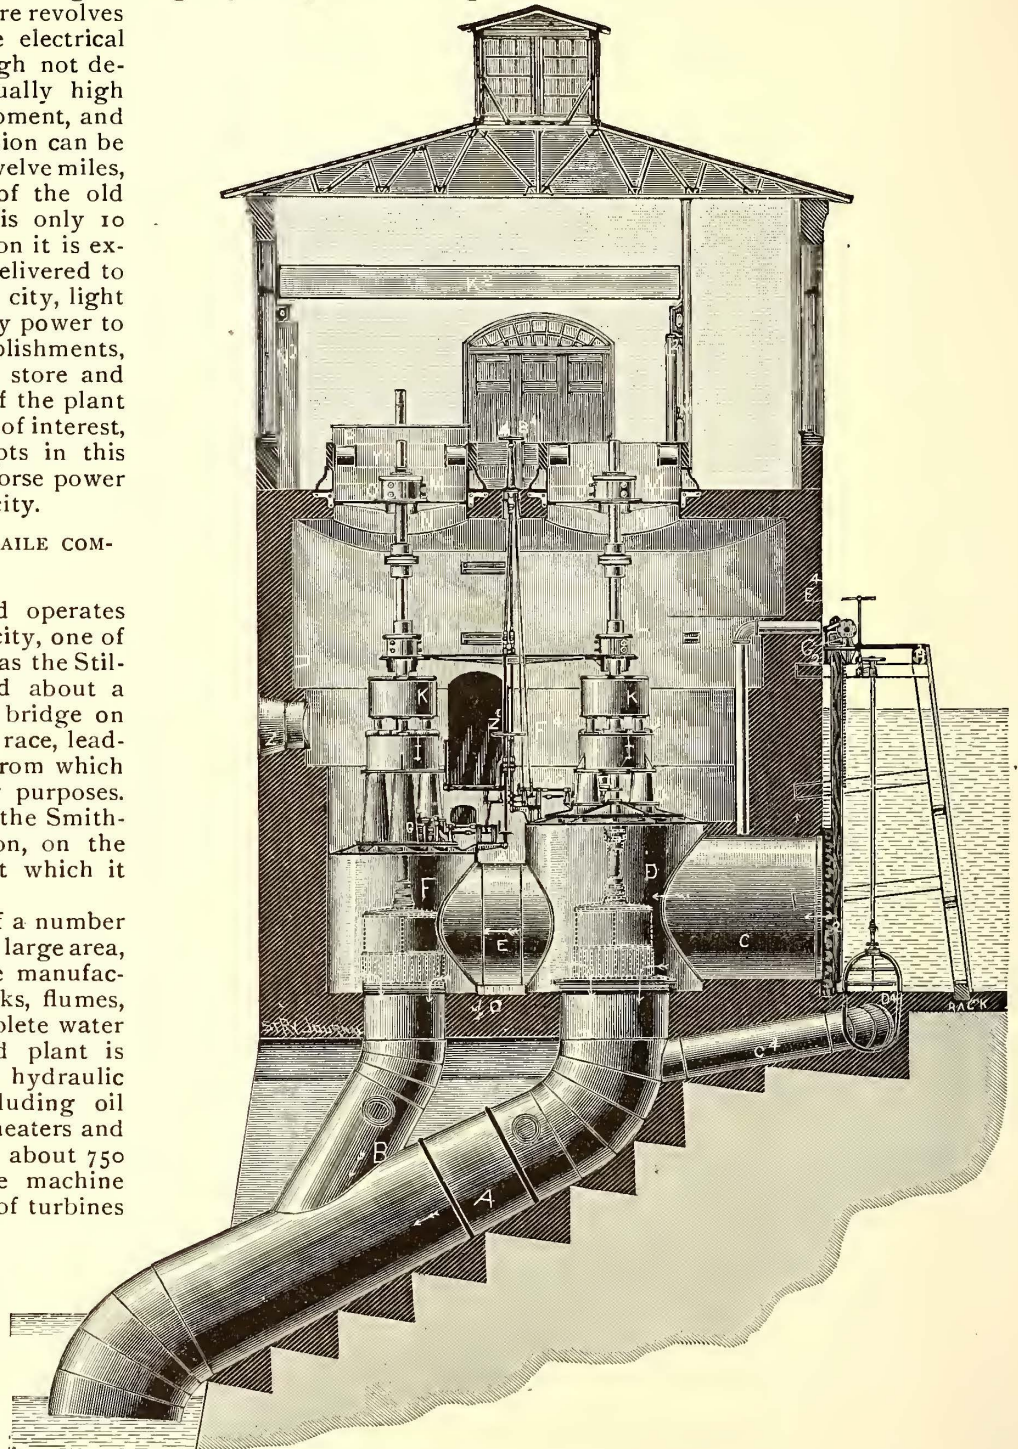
SECTIONAL ELEVATION OF 48-INCH WHEEL ROOM, LOOKING UP STREAM—PORTLAND, ORE.
